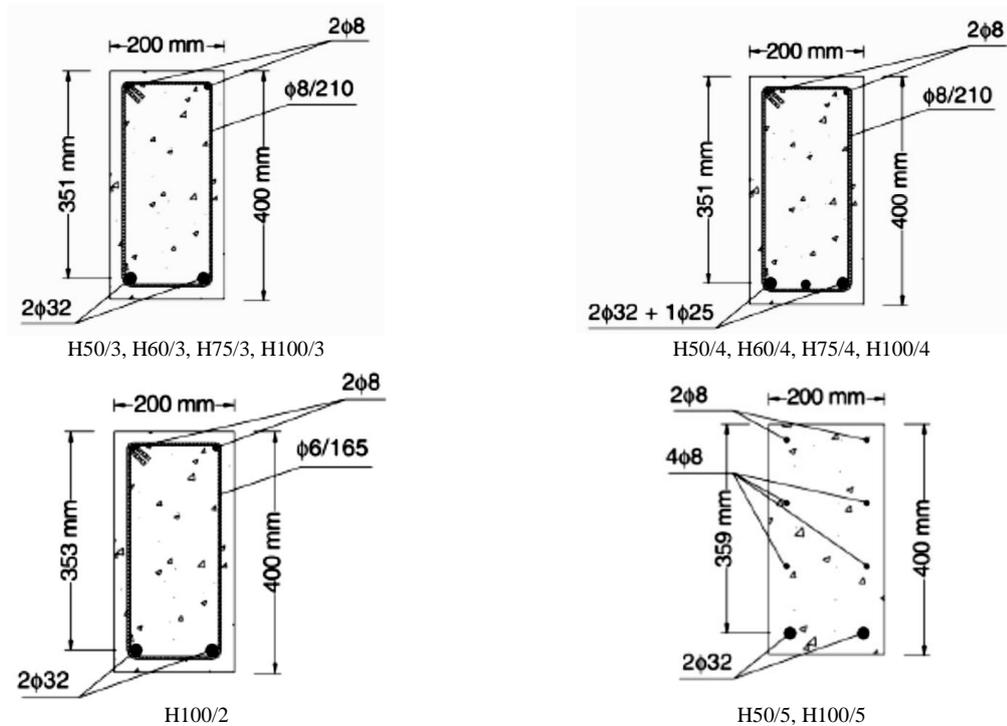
Beam Detailing, Cladera & Mari¹⁴
